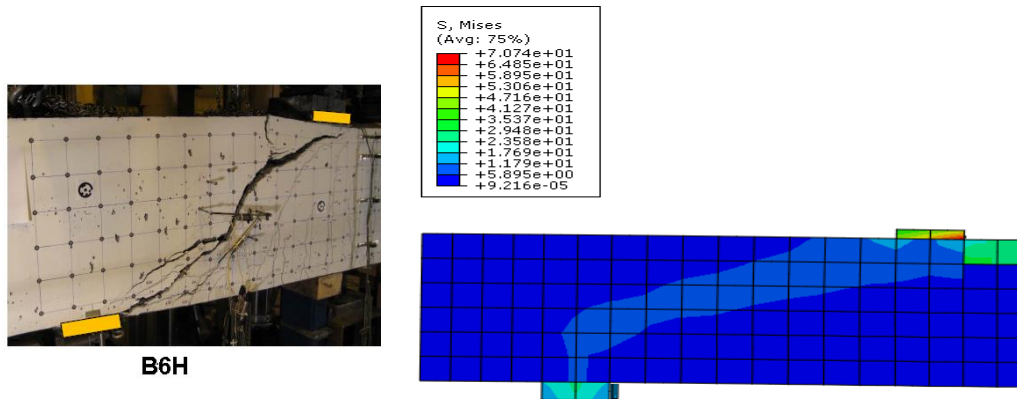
Experimental and Finite Element Pattern of Diagonal Concrete Tension Failure (DT) for Specimen B6H
